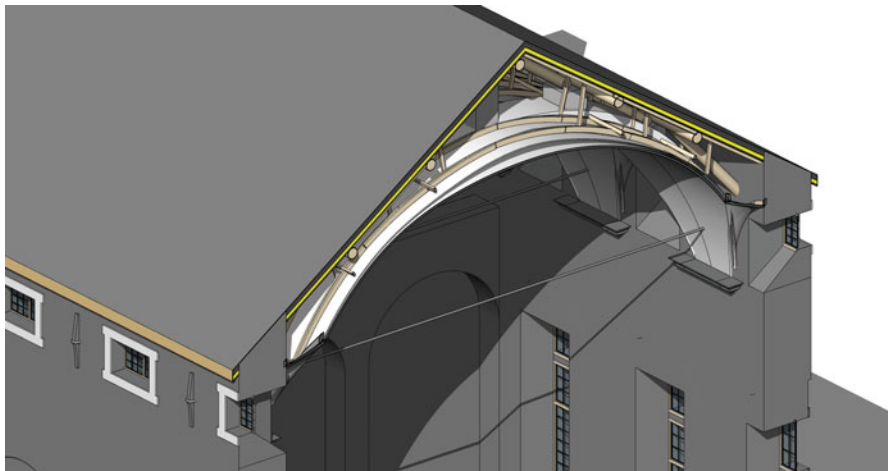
Thermal improvement of the roof (BIM model, Babbetto, R. 2015)
